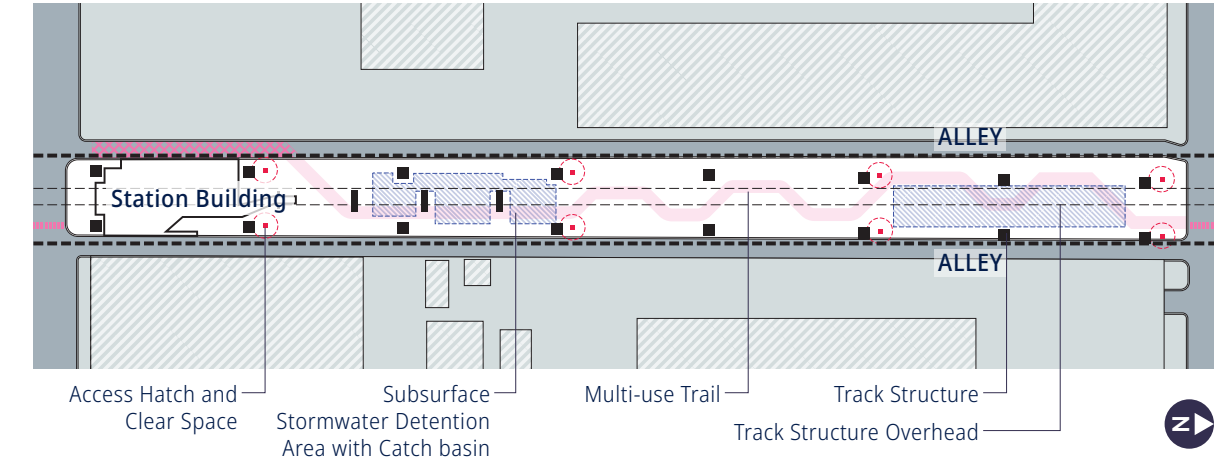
Typical elevated track structure plan view detailing ground level utility constraints
